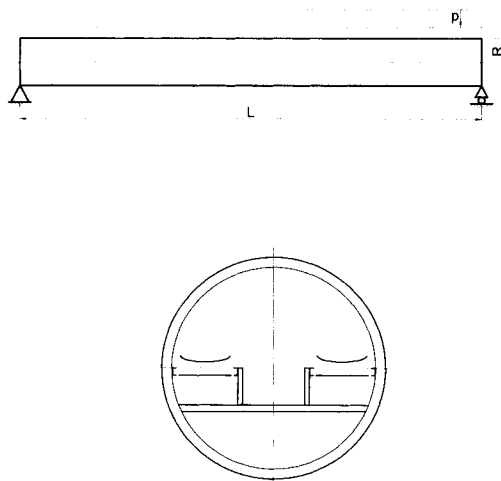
A simply supported belt-conveyor bridge with two belts, side view and cross-section
